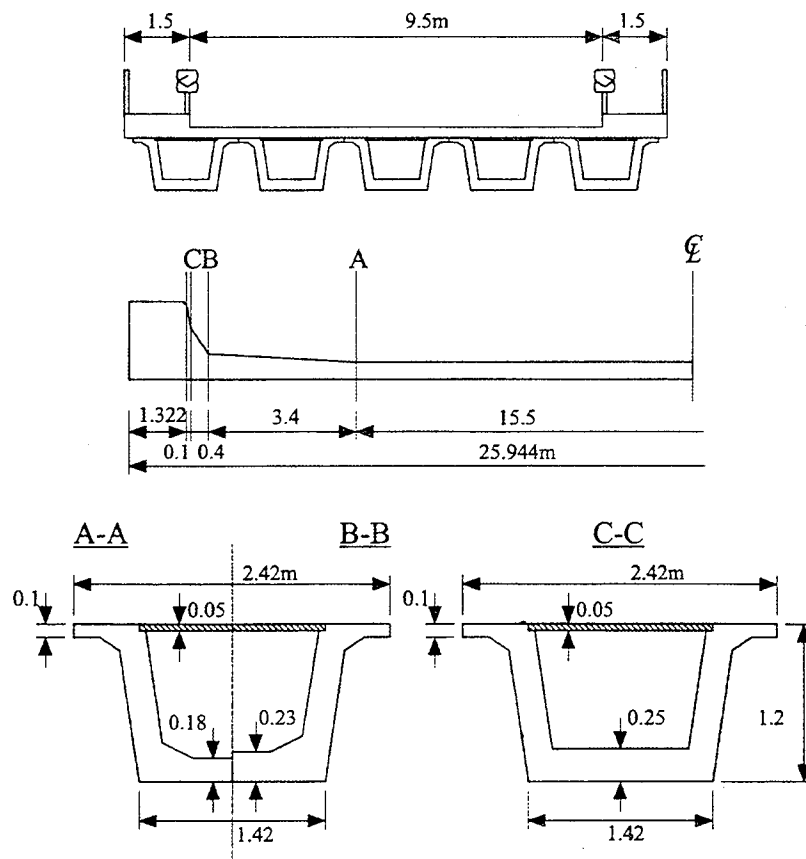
Cross Section of Arifiye Bridge (Courtesy of F. Inal and H. Hoashi)
